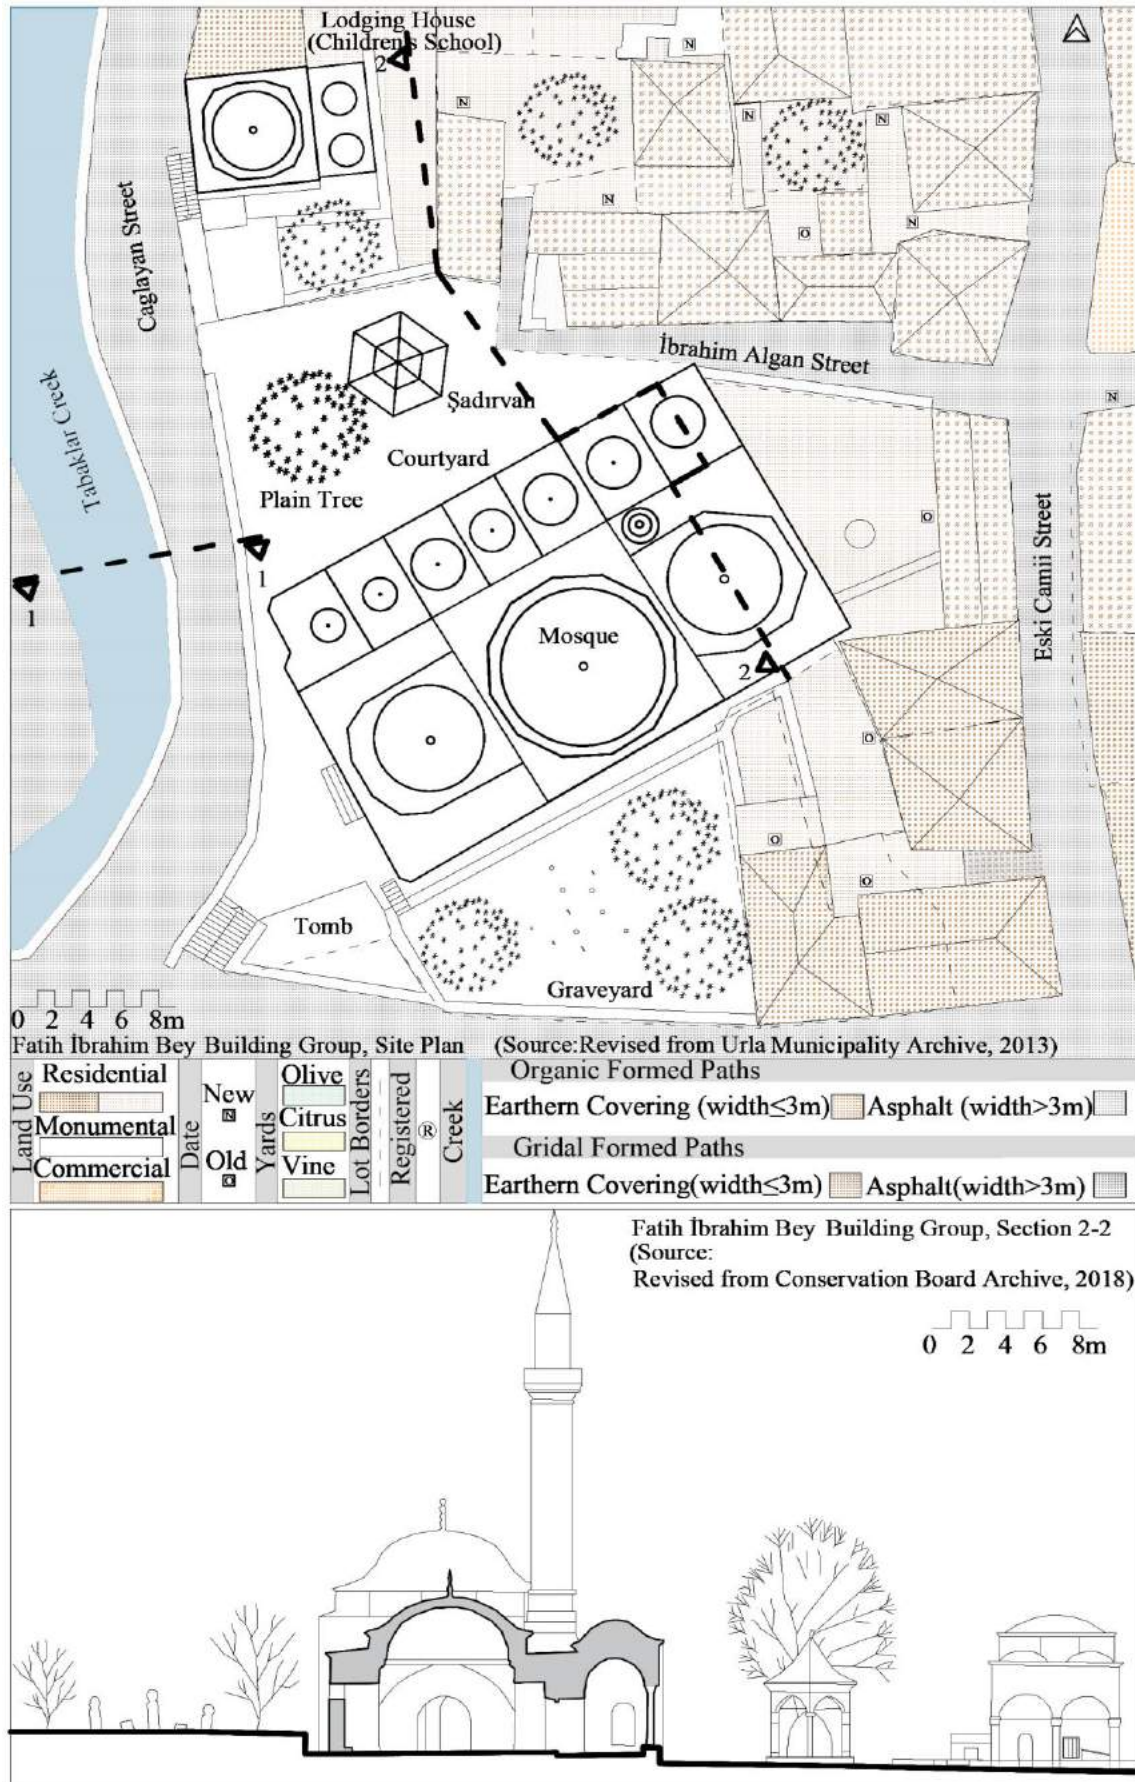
Site plan and silhouette section, Fatih Ibrahim Bey Building Group
